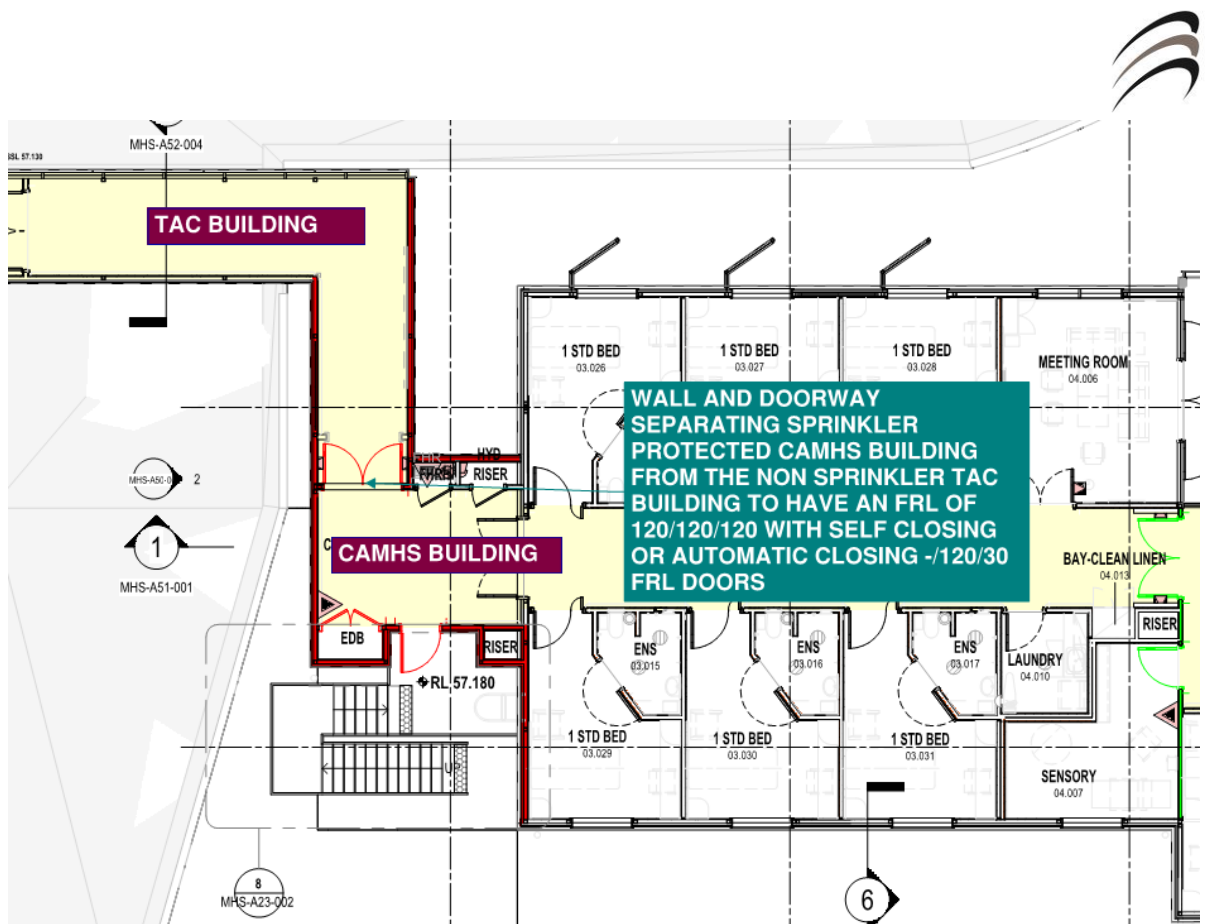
Separation of sprinkler v non-sprinkler protected parts of the building
